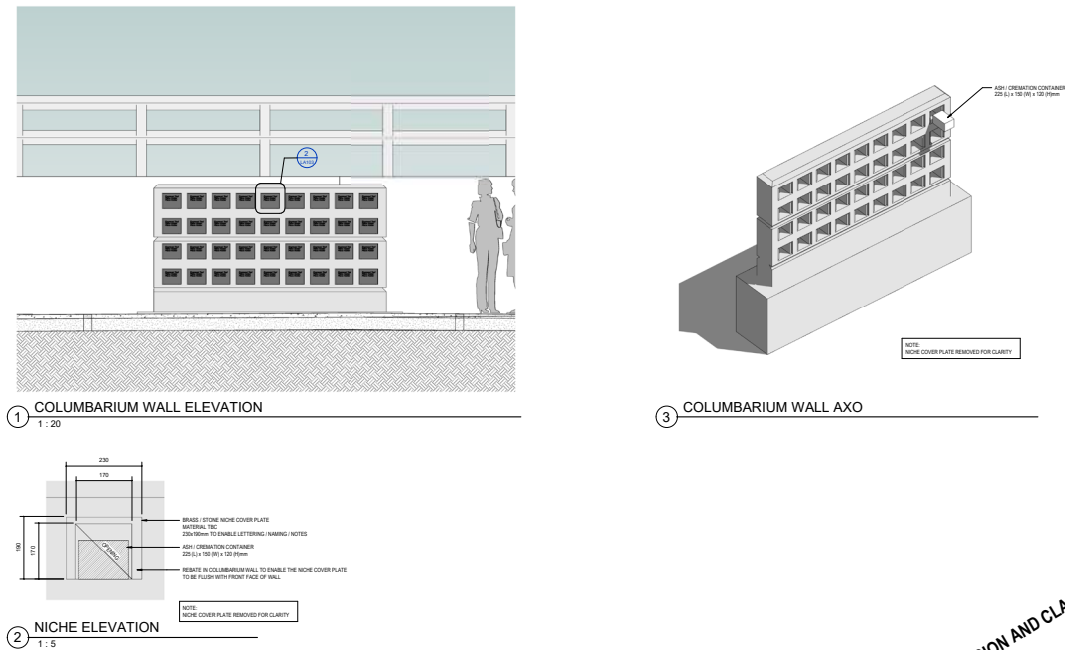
Further sections and elevations of proposed columbarium walls July 2023 (Source: Taylor Brammer Landscape Architects)
